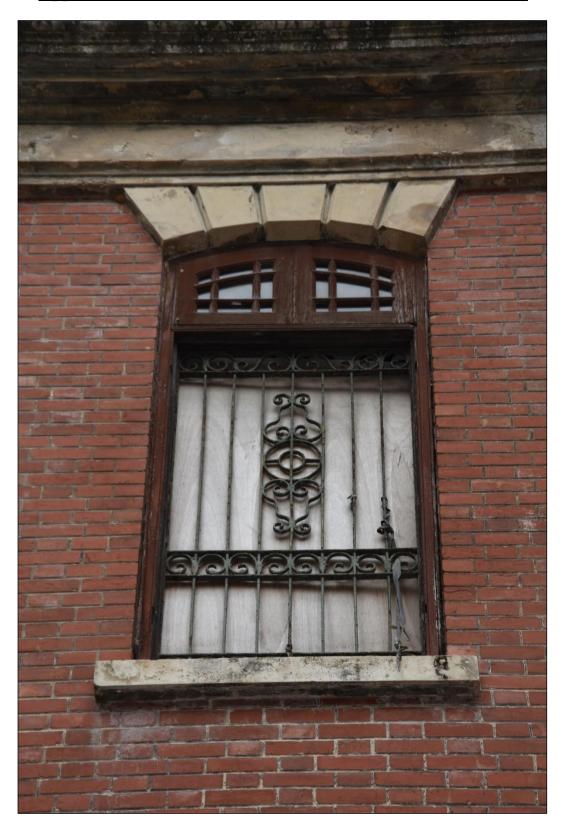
North-east elevation (front elevation), first floor, window Wdw-1f01, external side, covered with plywood panel, (21st March, 2023)
